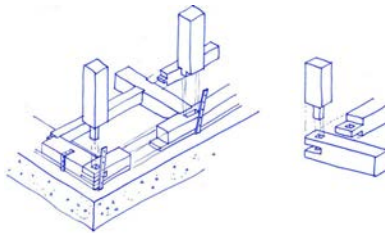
14. Corner post connection details. Note: This joint is difficult to make but crucial to keeping the dhajji frames together. More work is needed to optimise corner connection details for such traditional construction forms. The corners are potential locations for strategic strengthening.
